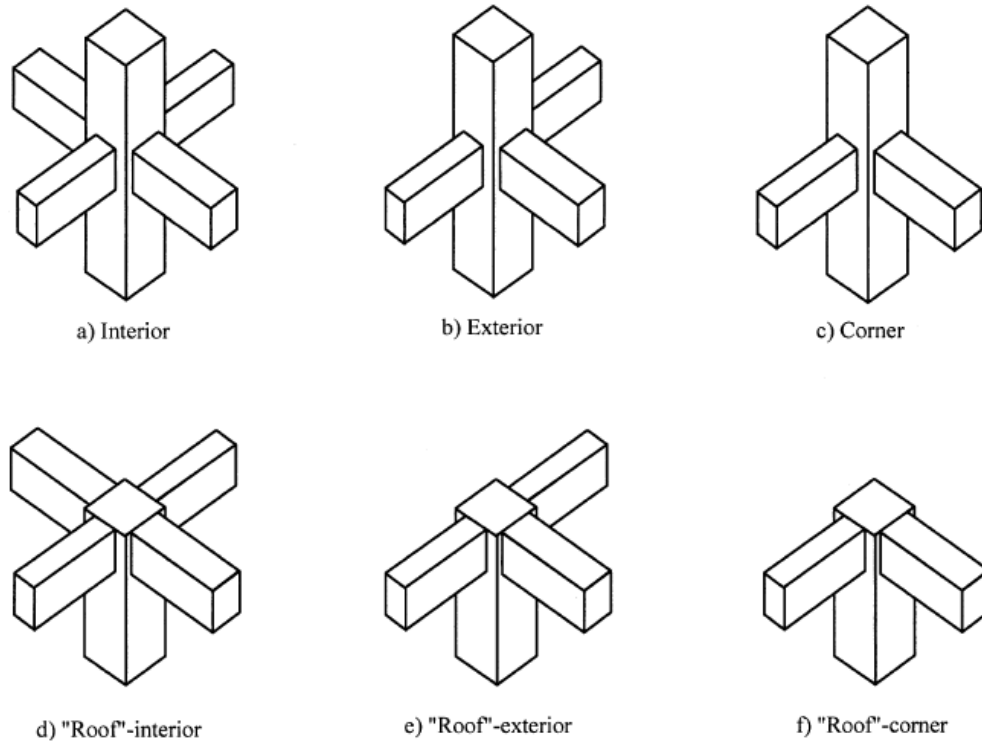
Typical beam-to-column connections (ACI 2002).
